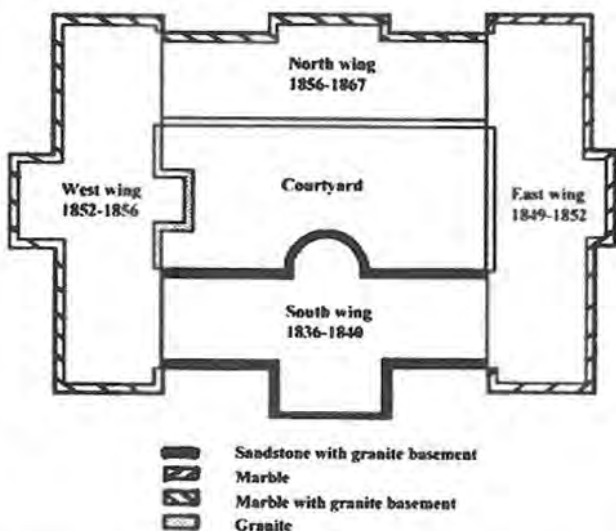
Plan of the US Patent Office Building showing stone facing materials and dates of construction.
